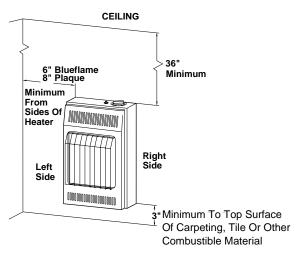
Mounting Clearances As Viewed From Front of Heater
